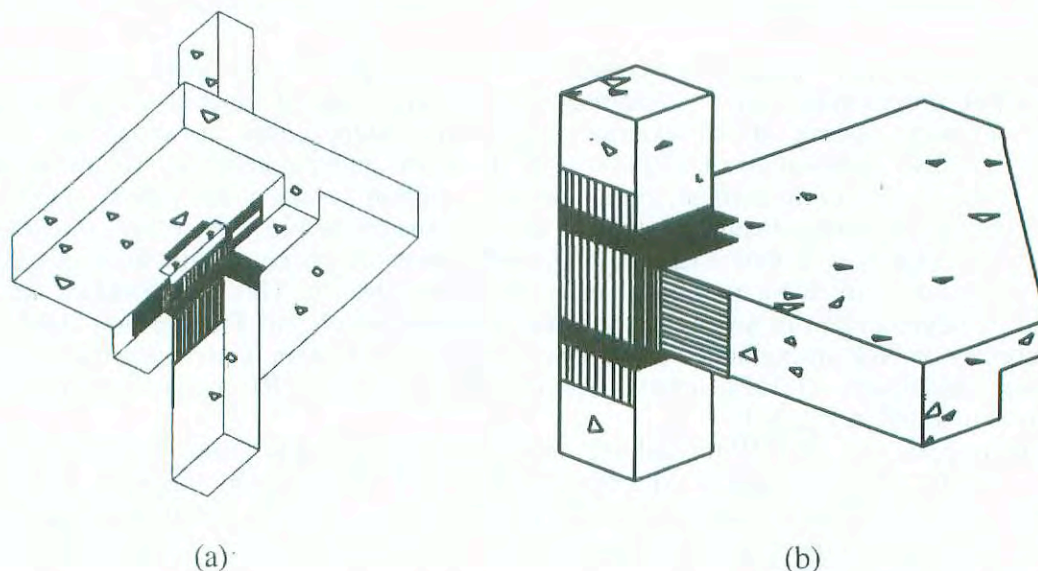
Concepts for shear strengthening of (a) exterior and (b) interior beam-column joints with FRP sheets (Antonopoulos and Triantafillou 2003).
